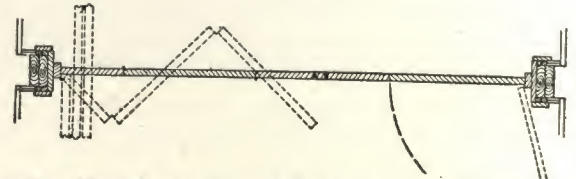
Plan showing two full-sized and one Half Door folding toward one side and a separate Swing Door hinged to opposite Jamb
